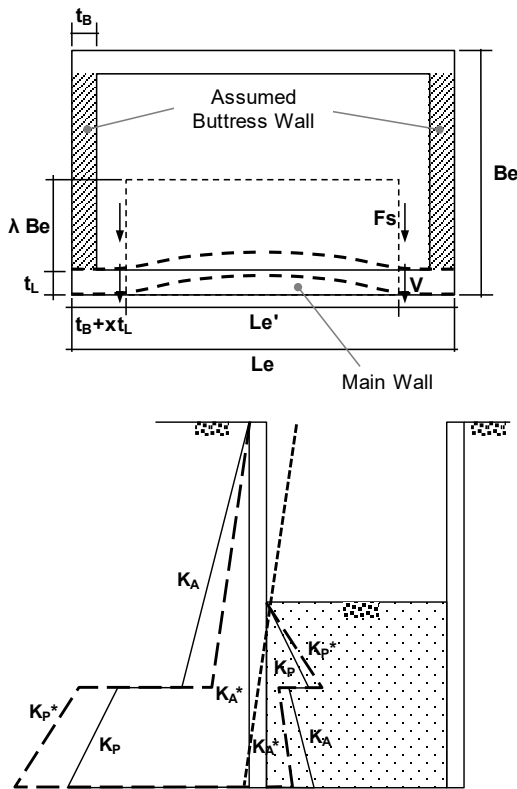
Plan and cross section views showing the assumptions adopted in the cross-wall option.
